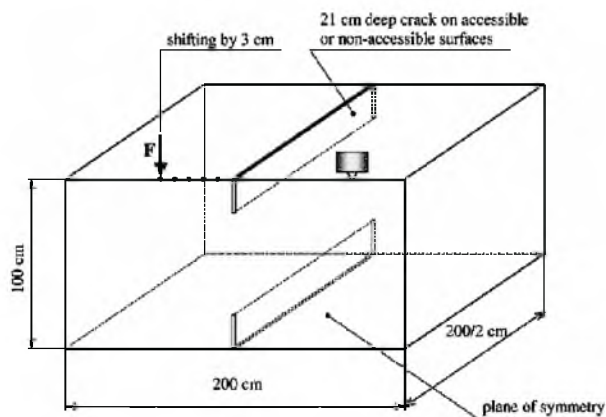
Scheme of tasks for calculations of wall with surface cracks.
